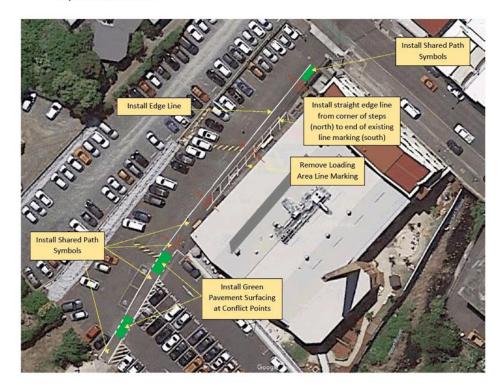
Extract – Midson Traffic Concept Plan – 40-50 Molle Street
